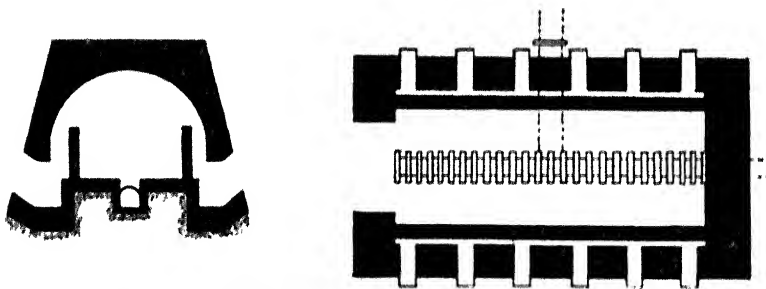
Cross Section and Plan of Down Draught Kiln.
